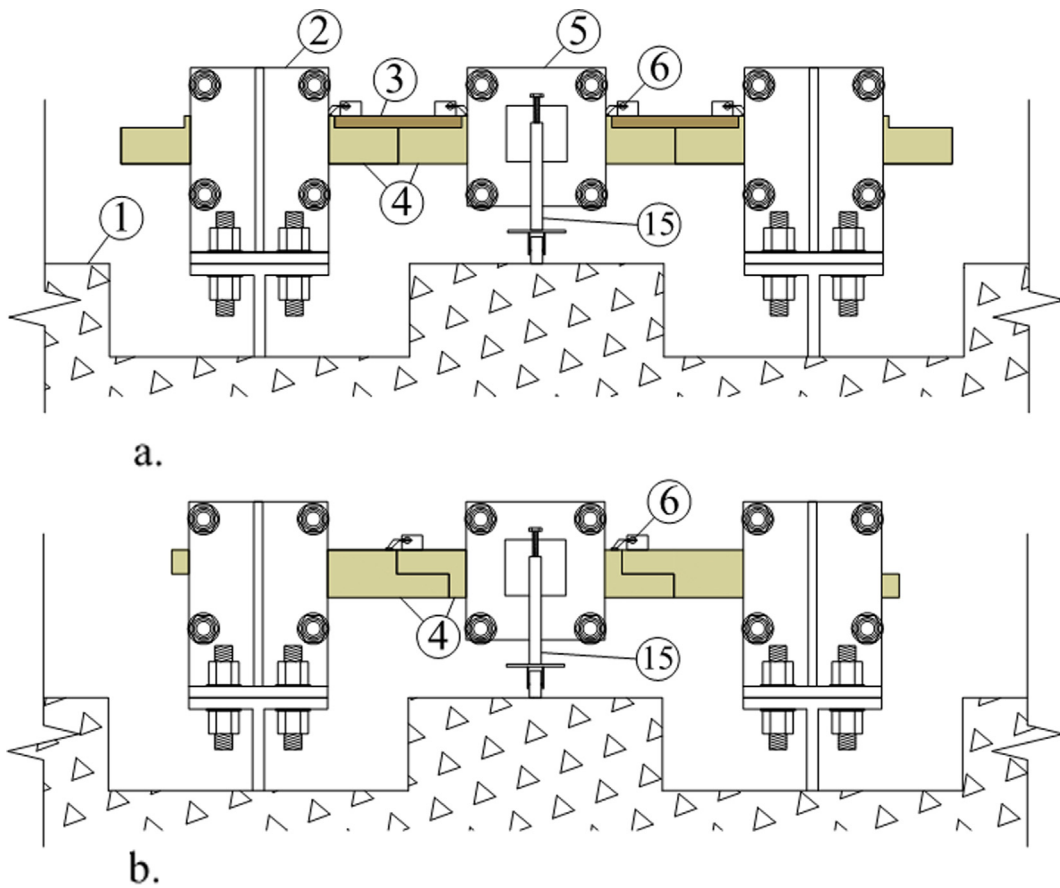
Test apparatus (a. front view spline specimen, b. front view half-lap specimen).
